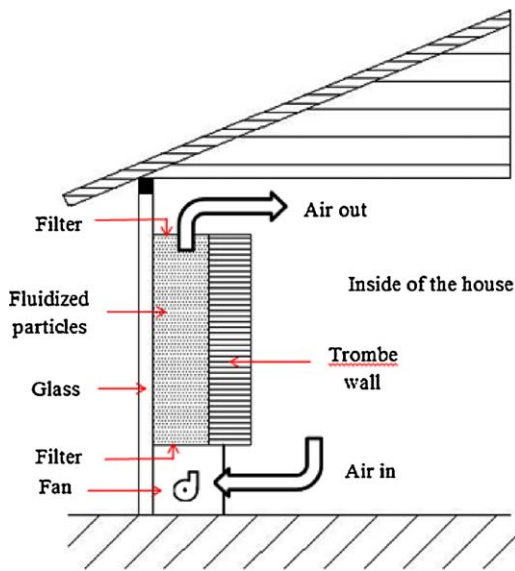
A cross-sectional view of fluidized Trombe wall system with part details. Source: Tunç and Uysal [19].
